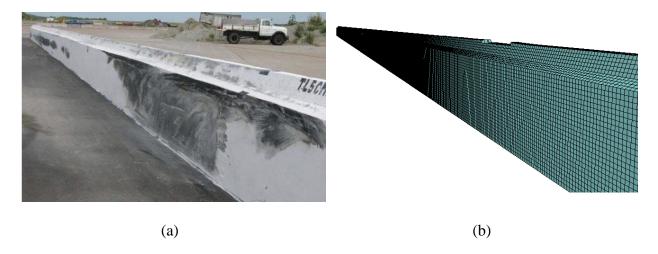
Concrete Median Barrier damage, (a) TL5CMB-2 Crash Test, (b) impact Simulation, adapted from [16]
